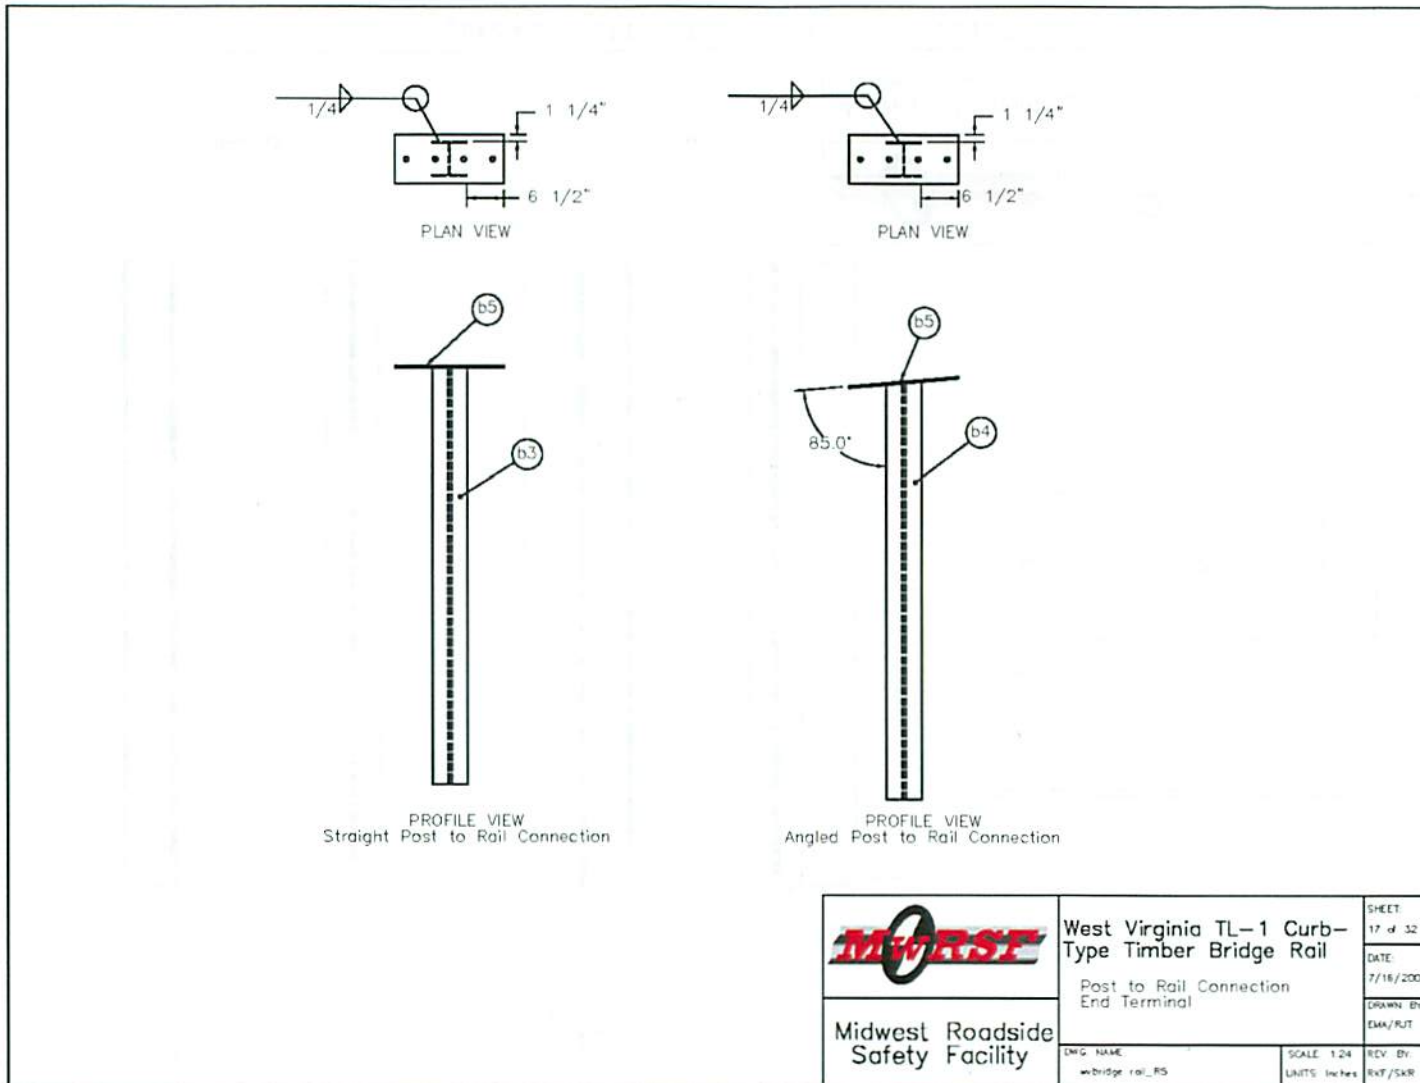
Steel Post Assembly Details, Test No. WVBR-1
